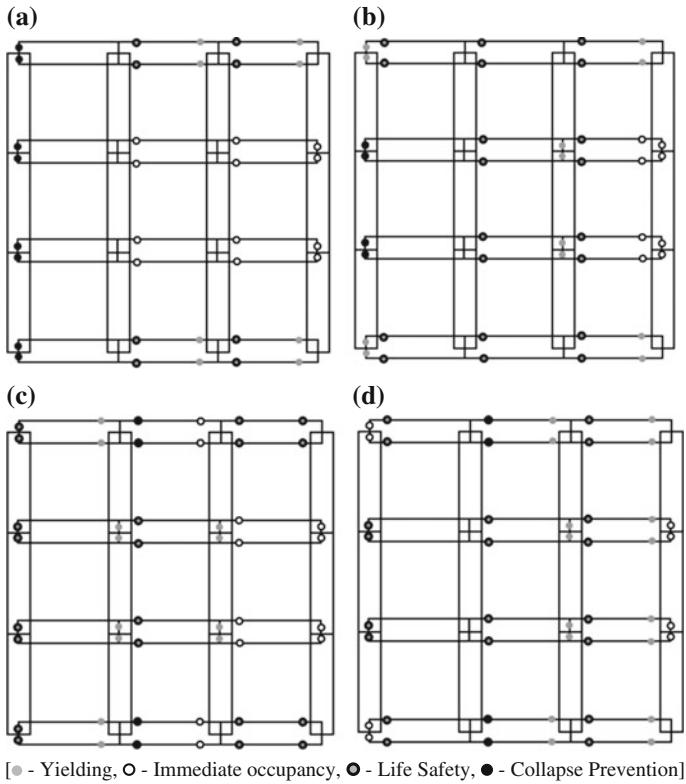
Typical hinge patterns of flat slab buildings without edge beams: a 5 storey building without continuity of slab bottom reinforcement, b 10 storey building without continuity of slab bottom reinforcement, c 5 storey building with continuity of slab bottom reinforcement, d 10 storey building with continuity of slab bottom reinforcement
